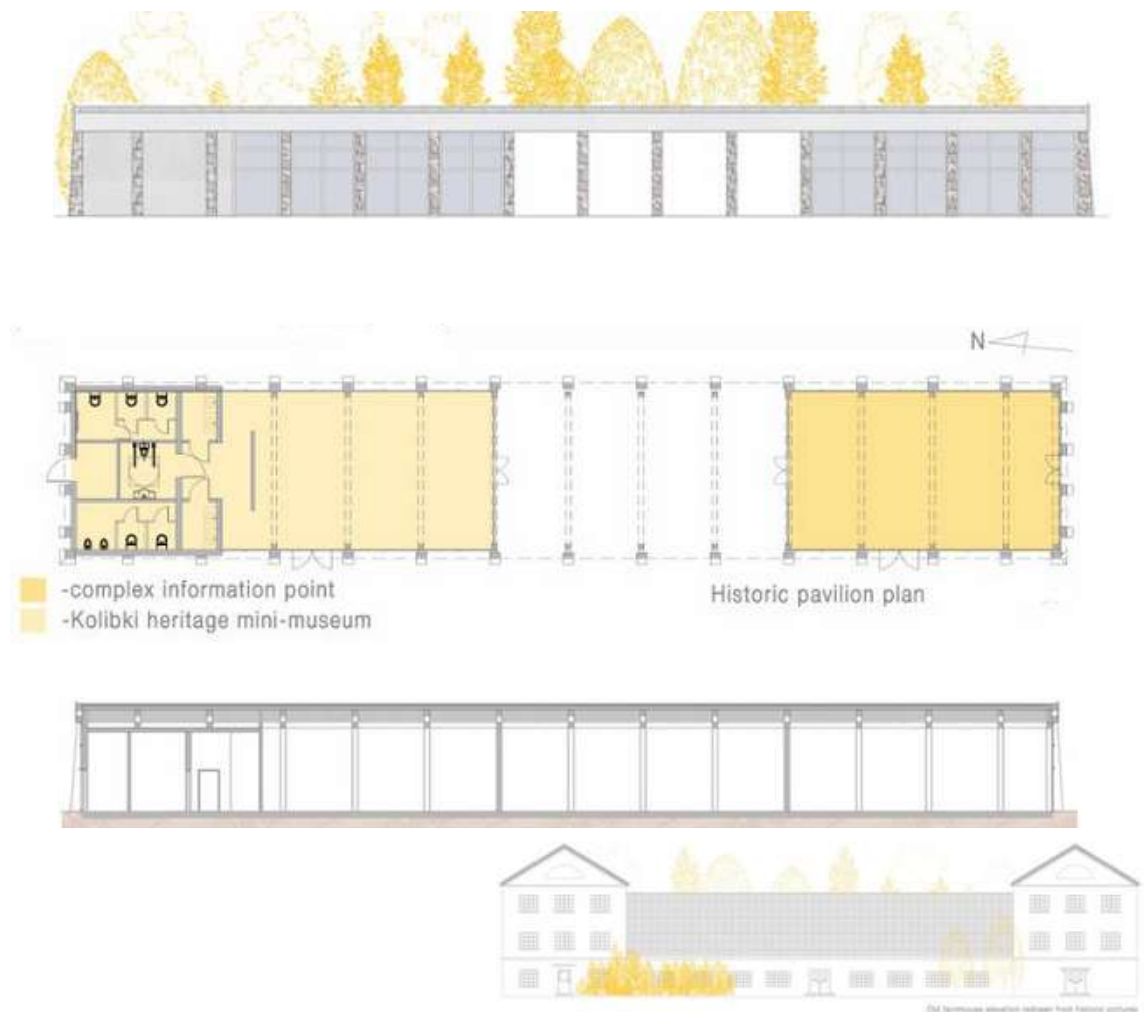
"History" pavilion (variant 1) design concept materials including general plan, front view, detail view and section and historic elevation of the non-existing farmhouse
